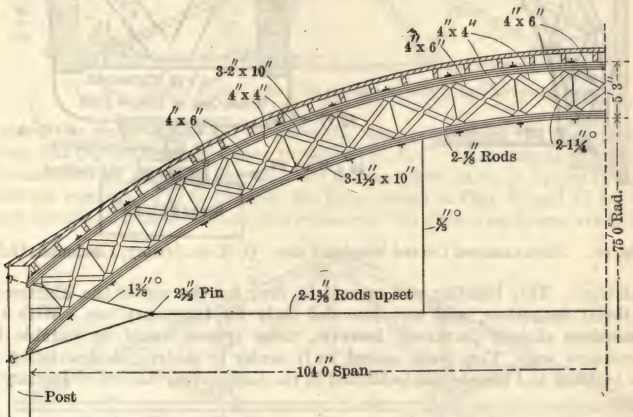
Arched Wooden Truss, Sanger Hall, Philadelphia, Pa.
